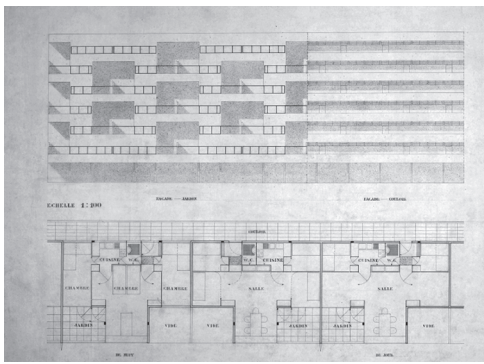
Wanner building, apartment "3CH M" (FLC 19391).
